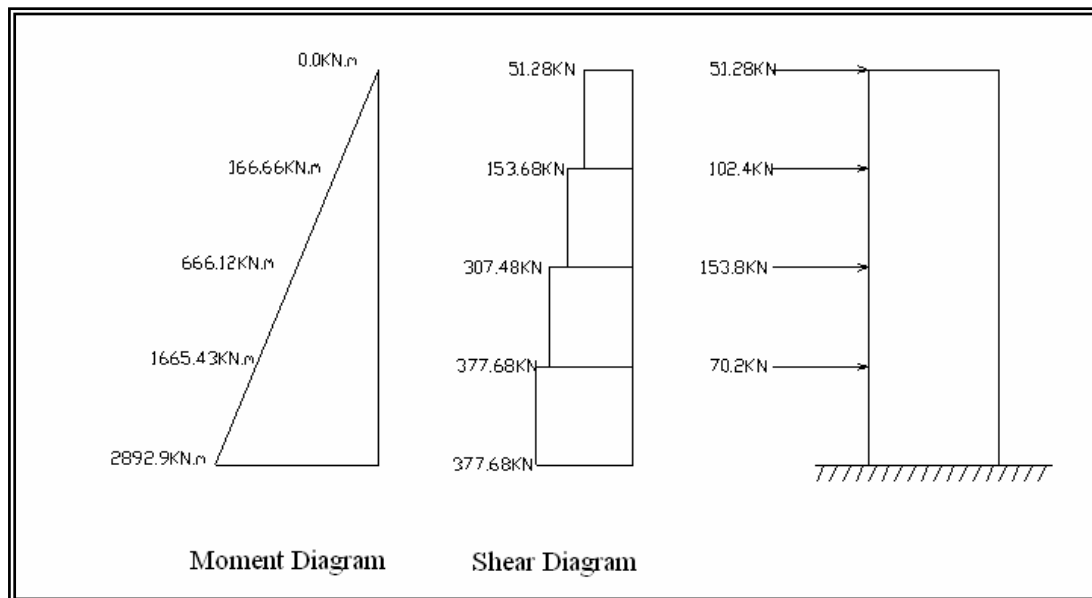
Moment and Shear Diagram of the Shear Wall
